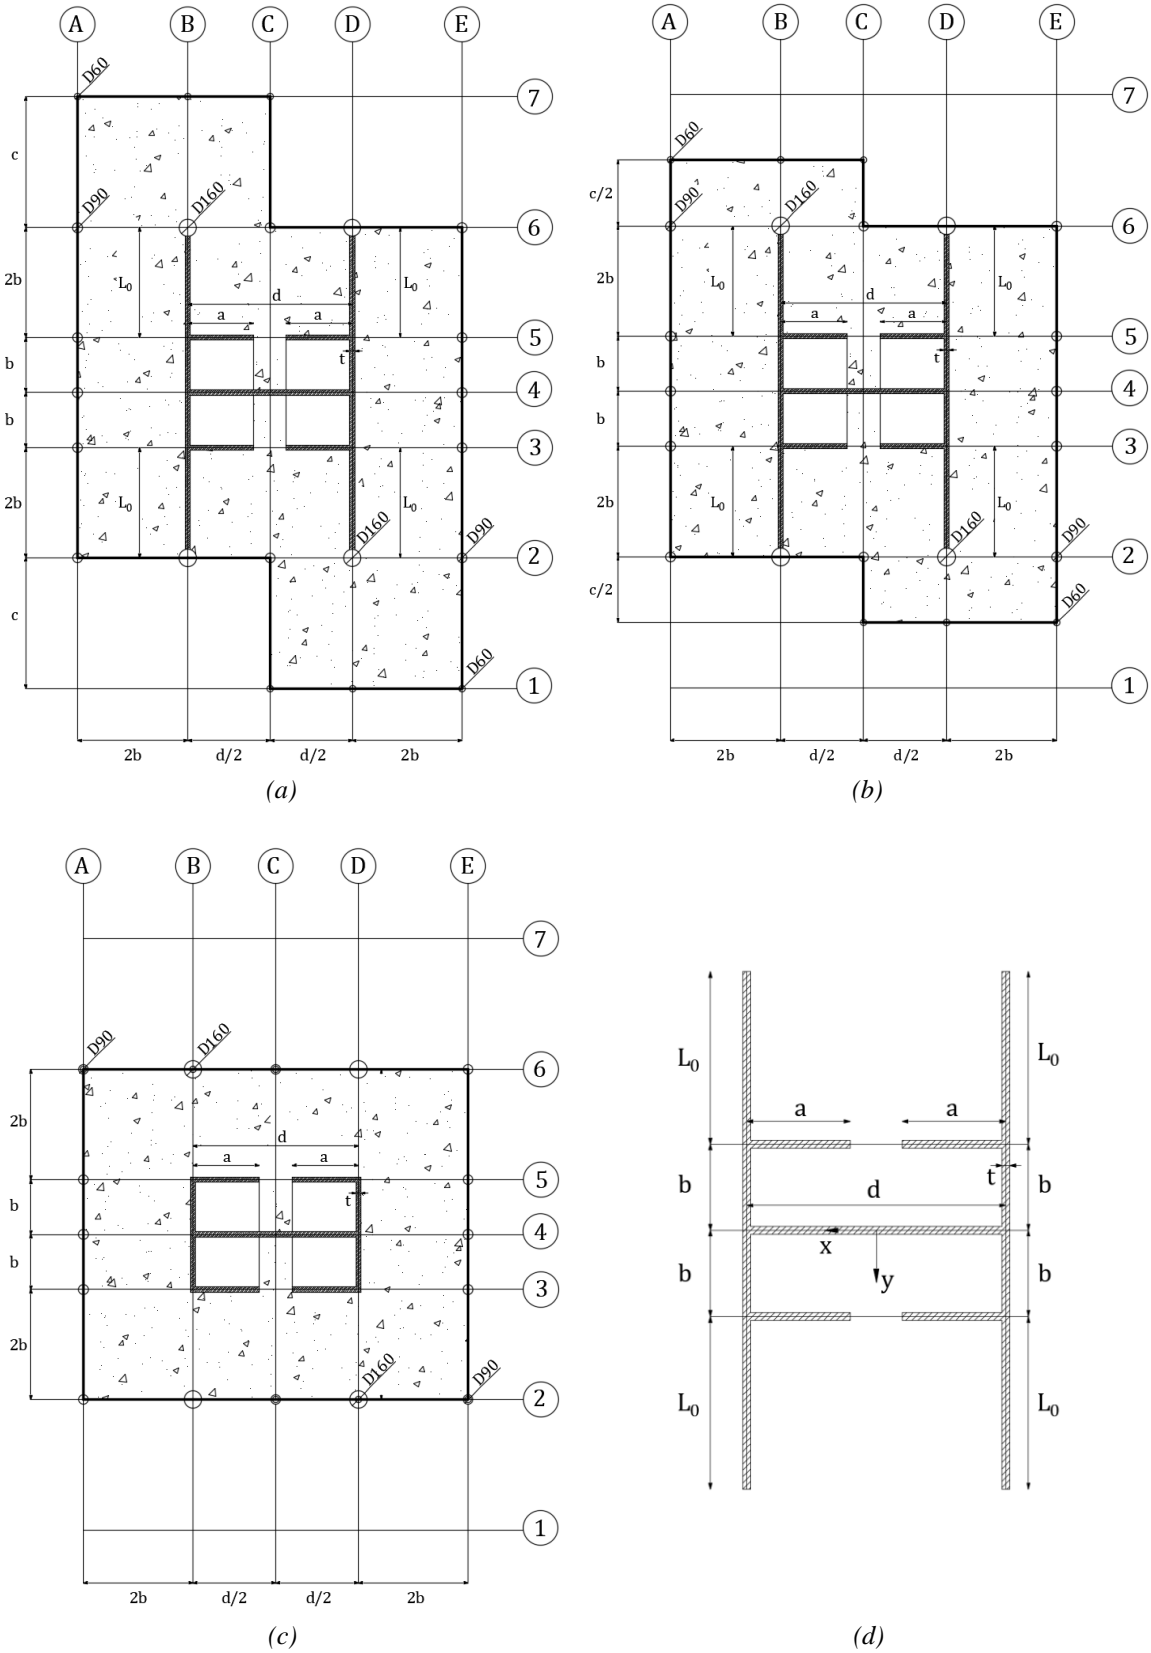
(a) Top floor; (b) Mid-height floor; (c) Mid-height floor; (d) Core-Outriggers system
